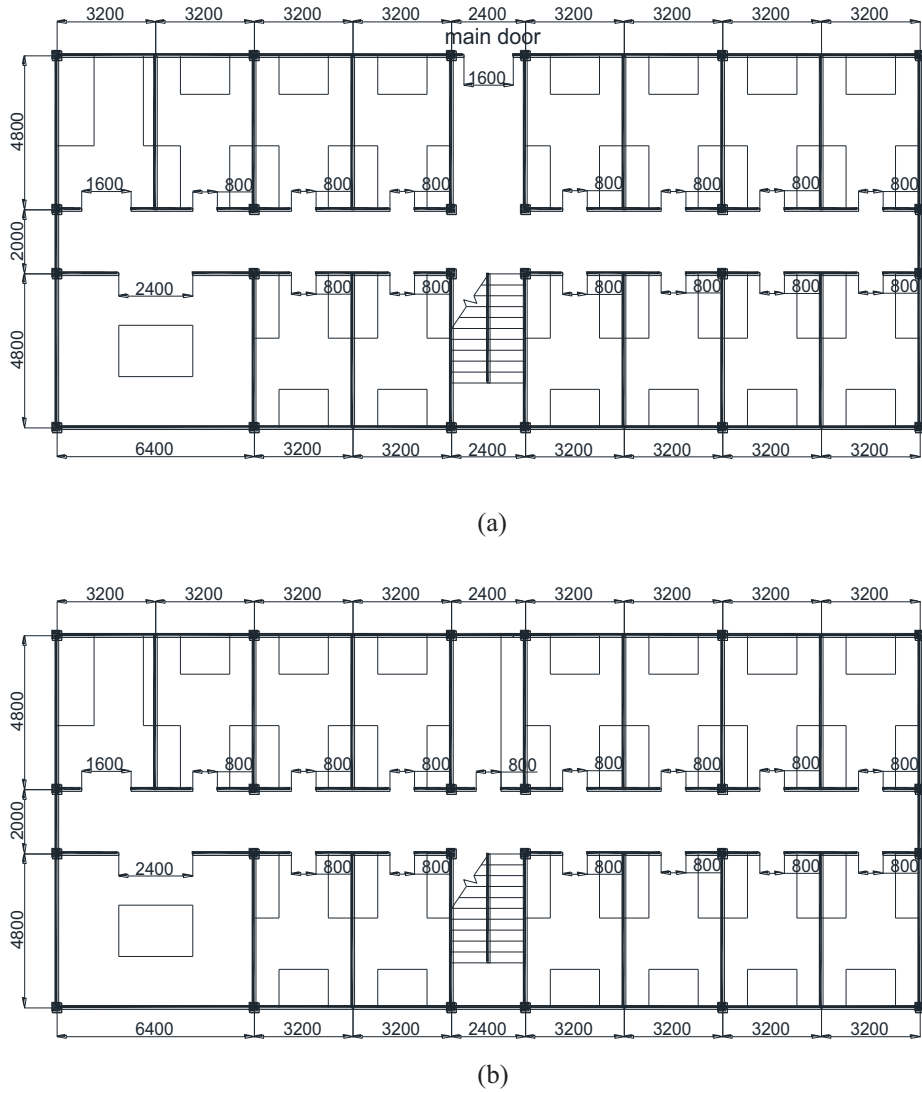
Plan layout of the official building (unit: mm): (a) the first floor and (b) the second floor.
